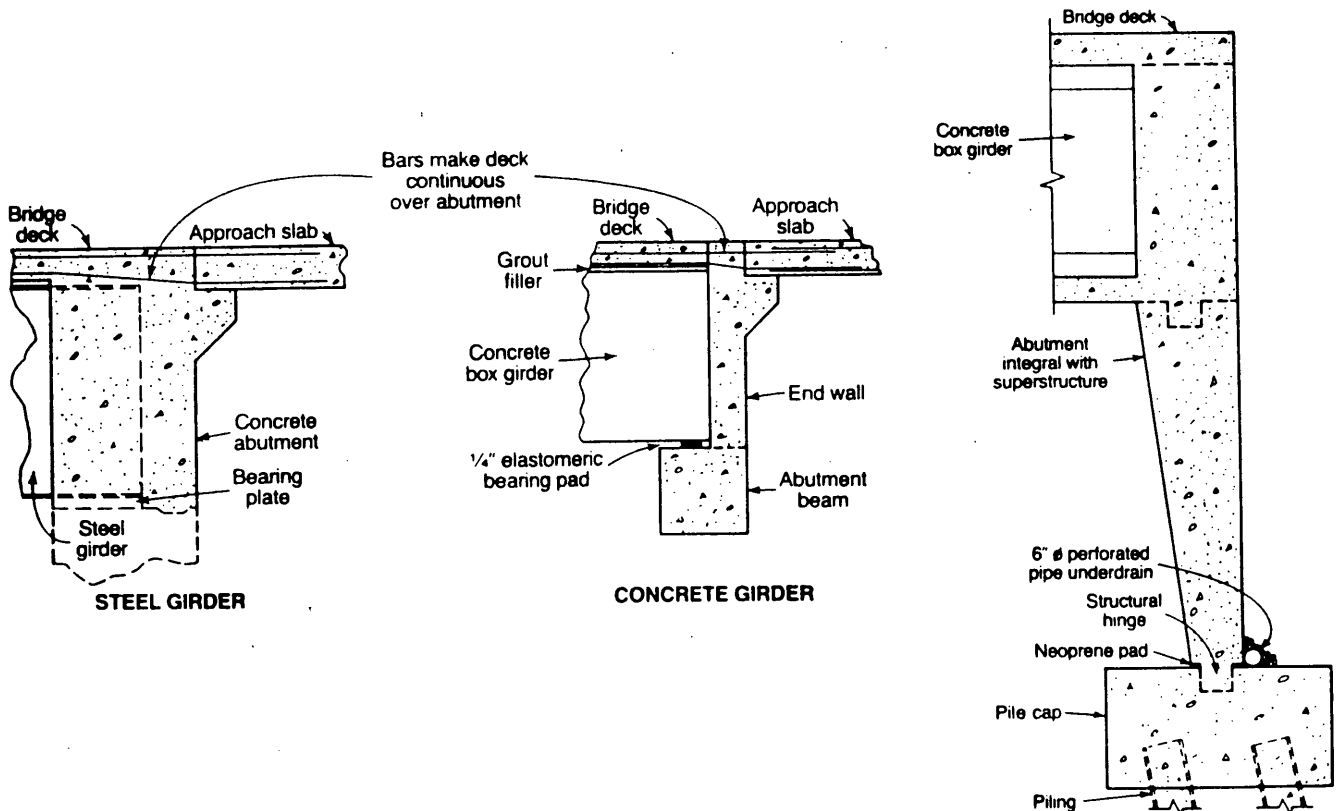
Typical details of integral abutment bridge construction used in Tennessee.
